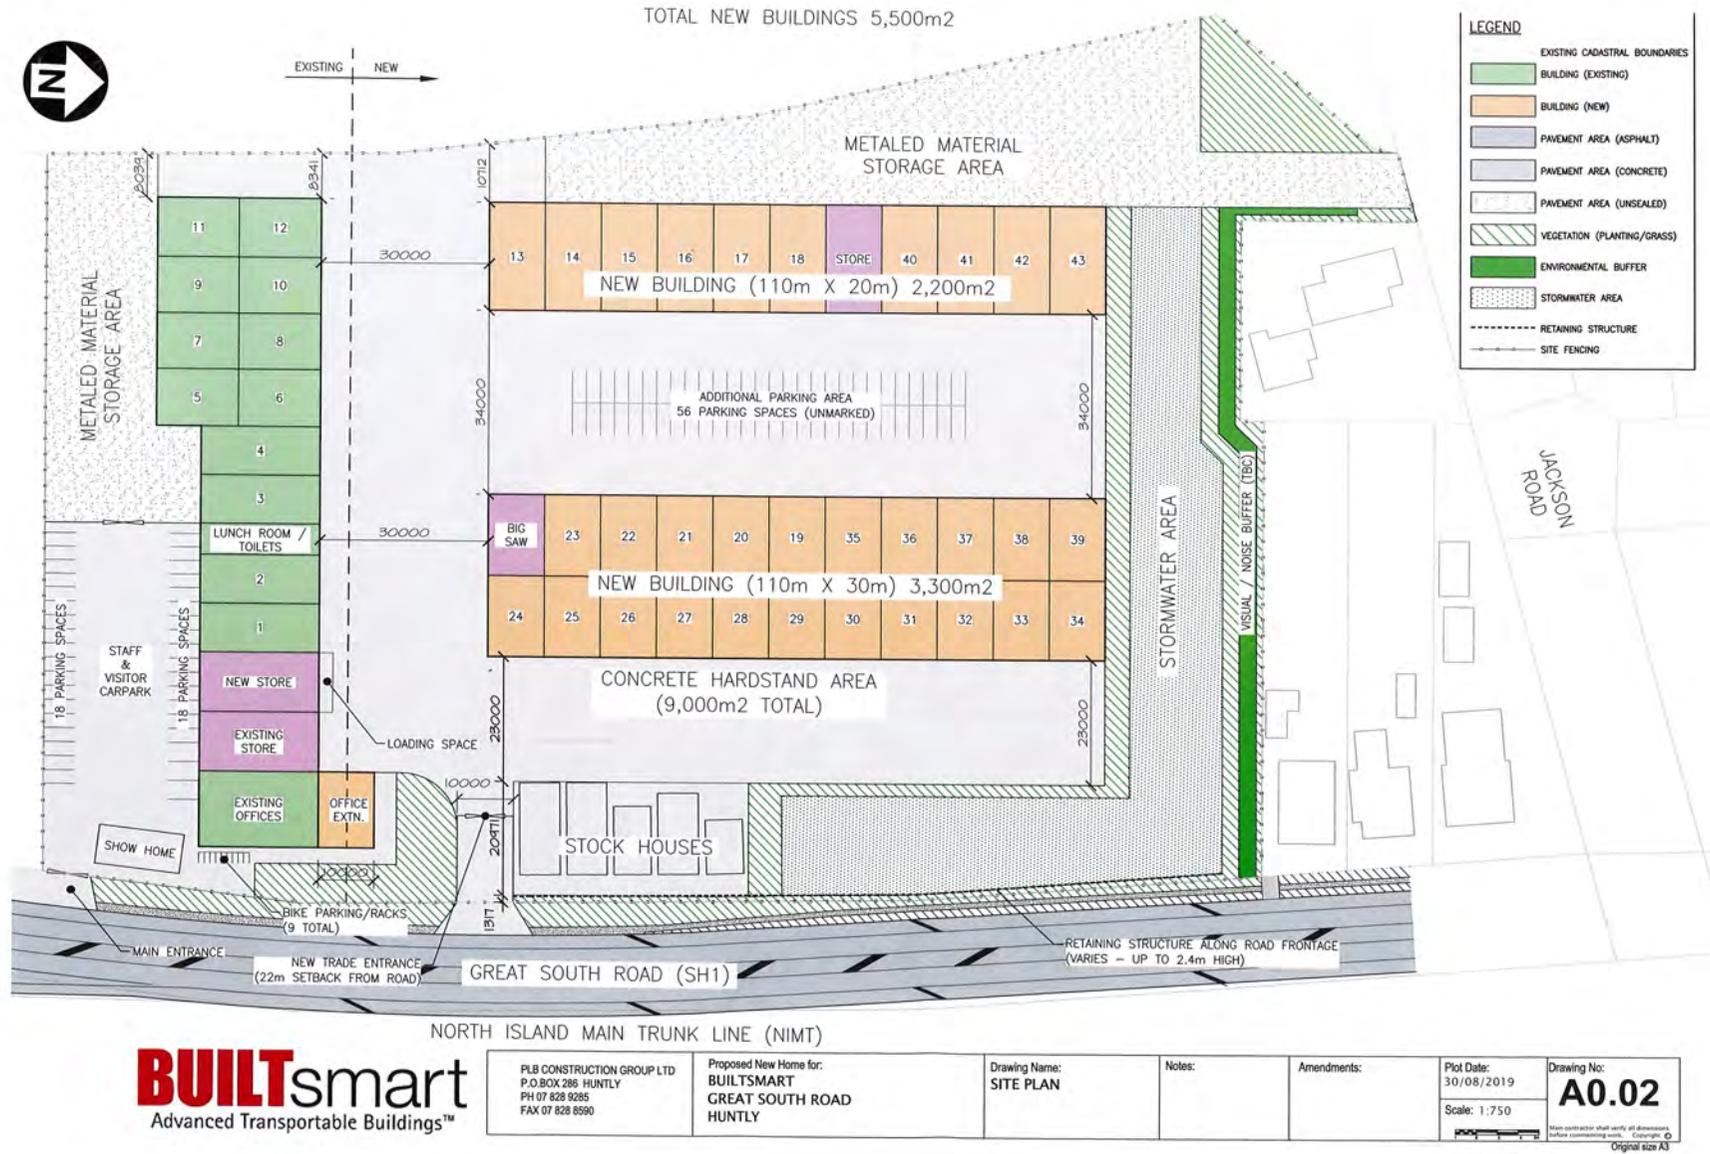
Indicative Builtsmart Expansion Area Site Layout.
